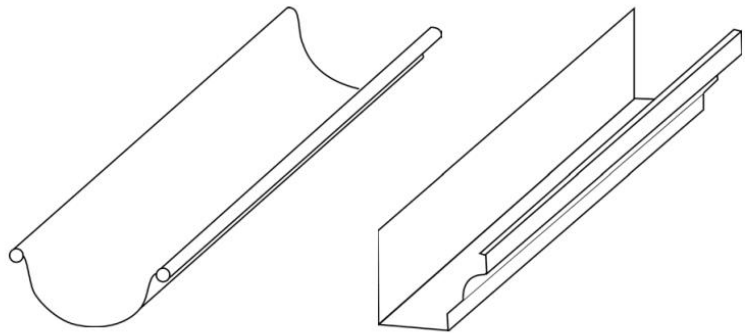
Half-round gutters (left) are the typical gutter style seen throughout the historic district. Half-round gutters best represent the rain system style of colonial houses. K-style gutters (right) were introduced in the late 1940s.
